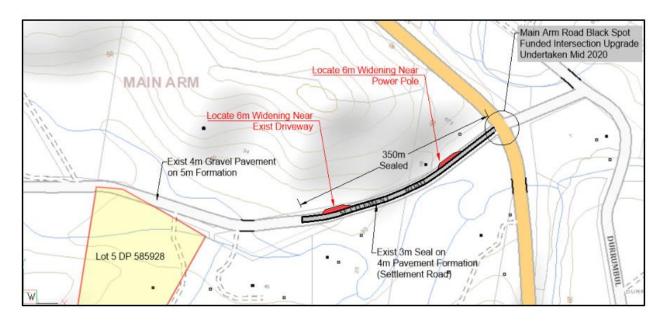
Existing Settlement Road and passing bay options (Source: Traffic Safety Assessment prepared by SDS Civil Enterprises dated September 2021)
